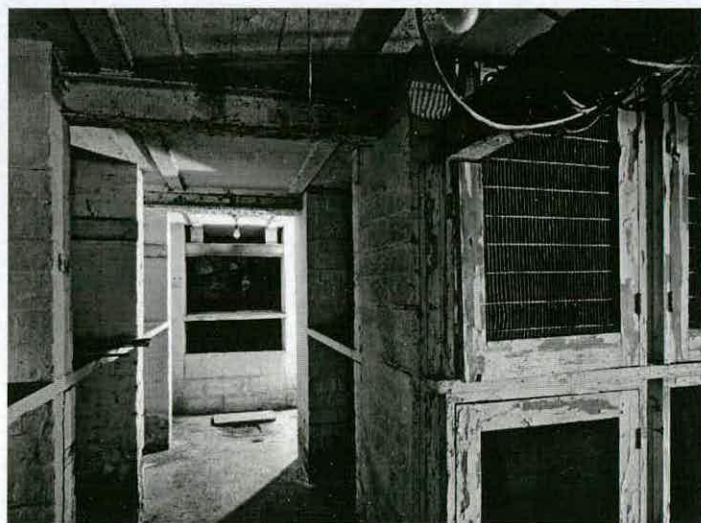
View from west along east-west passage of sub-basement. Inserted British Standard Beams provide additional support to the original rolled steel joists. (EH, BB99/09020).
